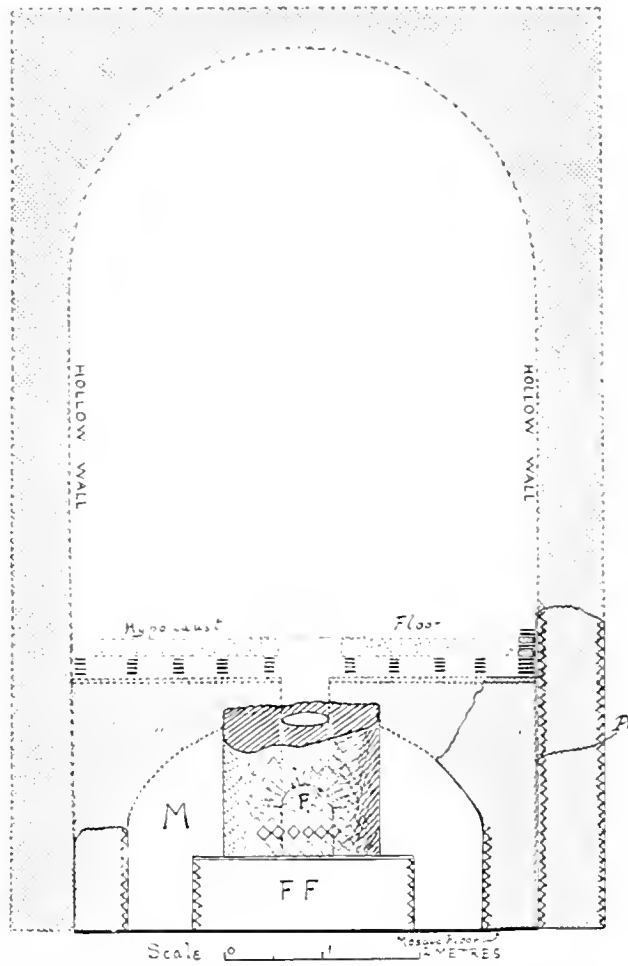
CONJECTURAL RESTORATION OF BUILDING OVER THE NEW FURNACE ROOM.
